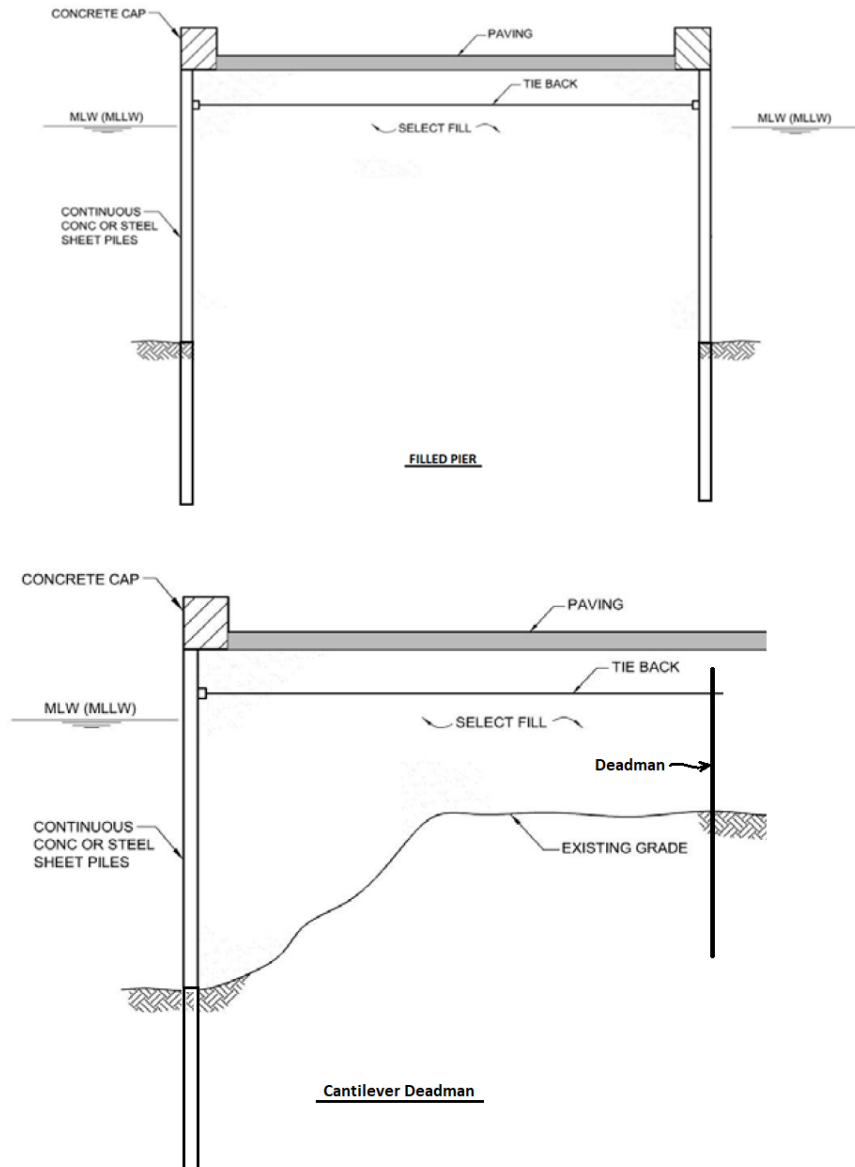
, Typical Section of Cantilever Deadman & Filled Pier
